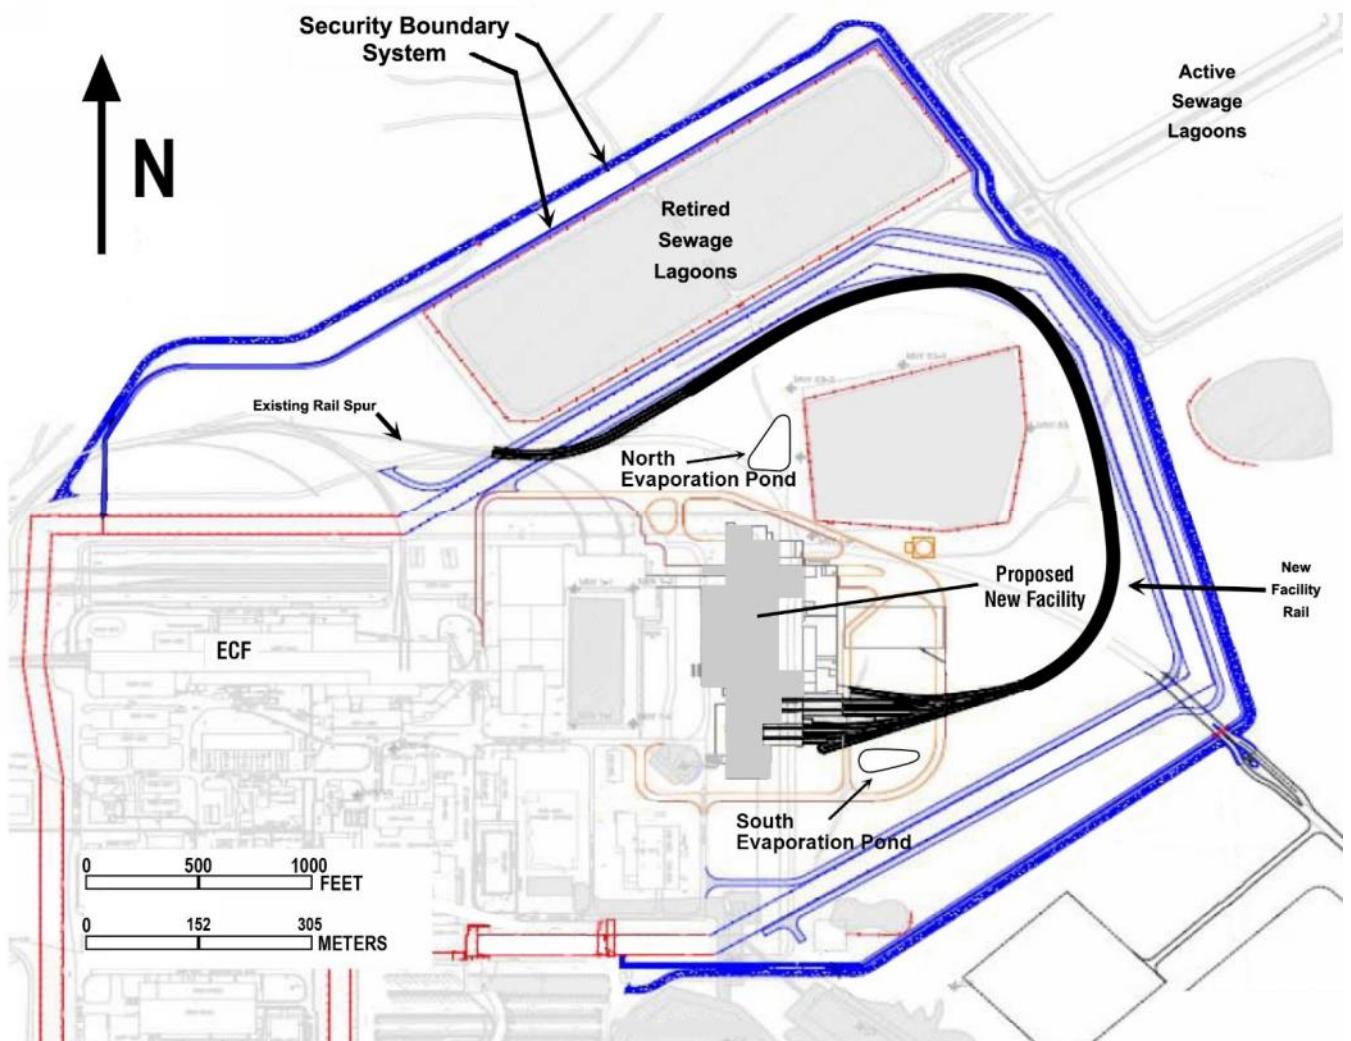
New Security Boundary System for the New Facility Alternative at Location 3/4
